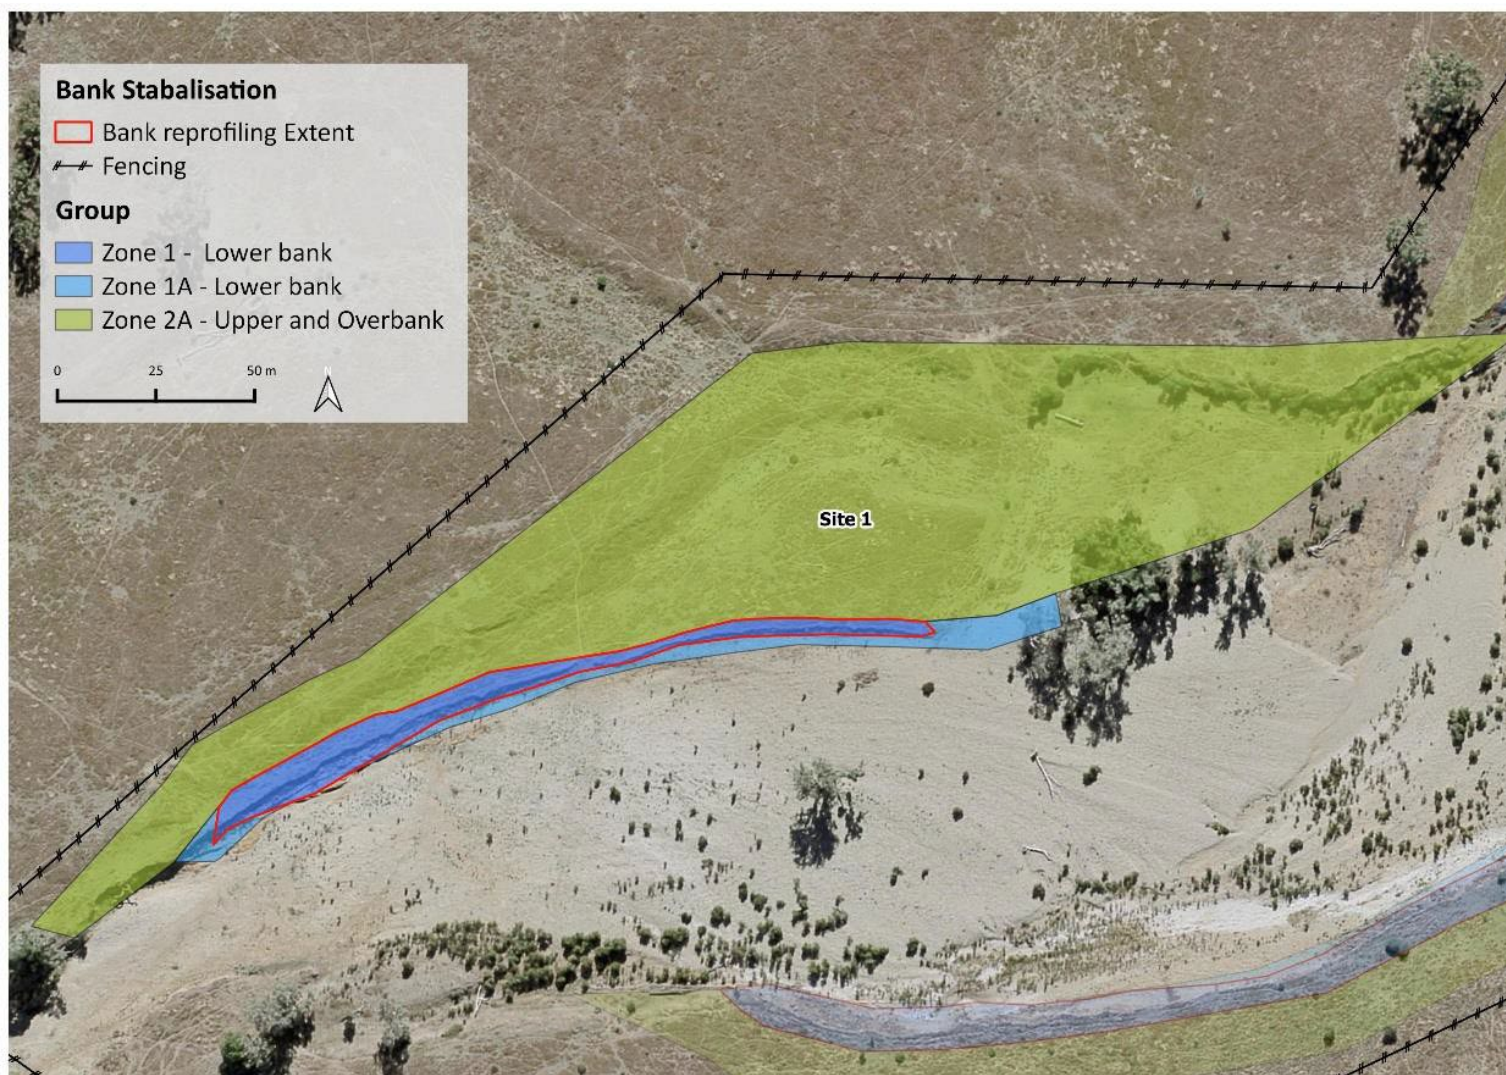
Concept design plan view with revegetation (provided by Alluvium)
